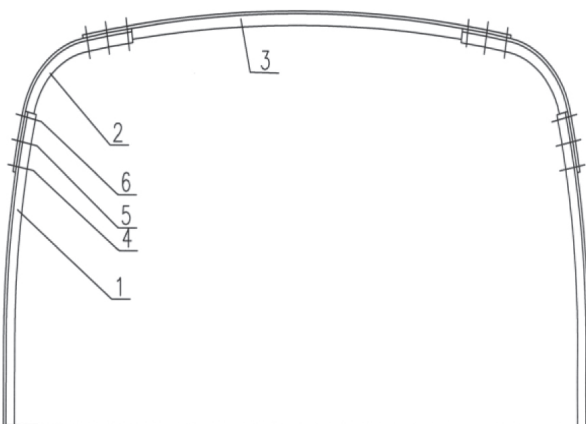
ŁPrP frame variant K: 1 – side section I, 2 – side section II, 3 – top section, 4-6 – shackles
